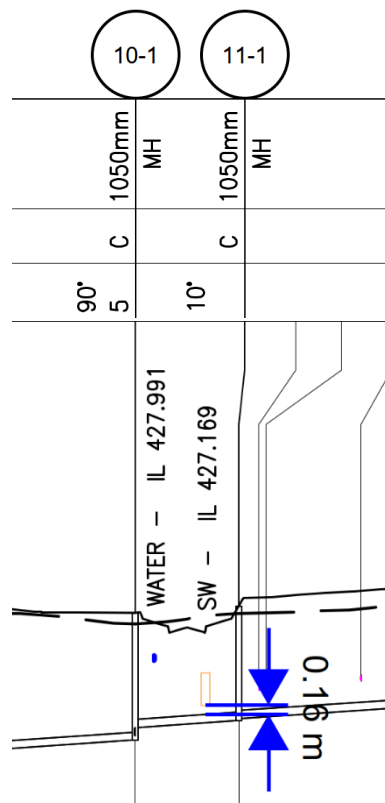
Extract from Sewer Longitudinal Section from Manhole 10/1 to 11/1
